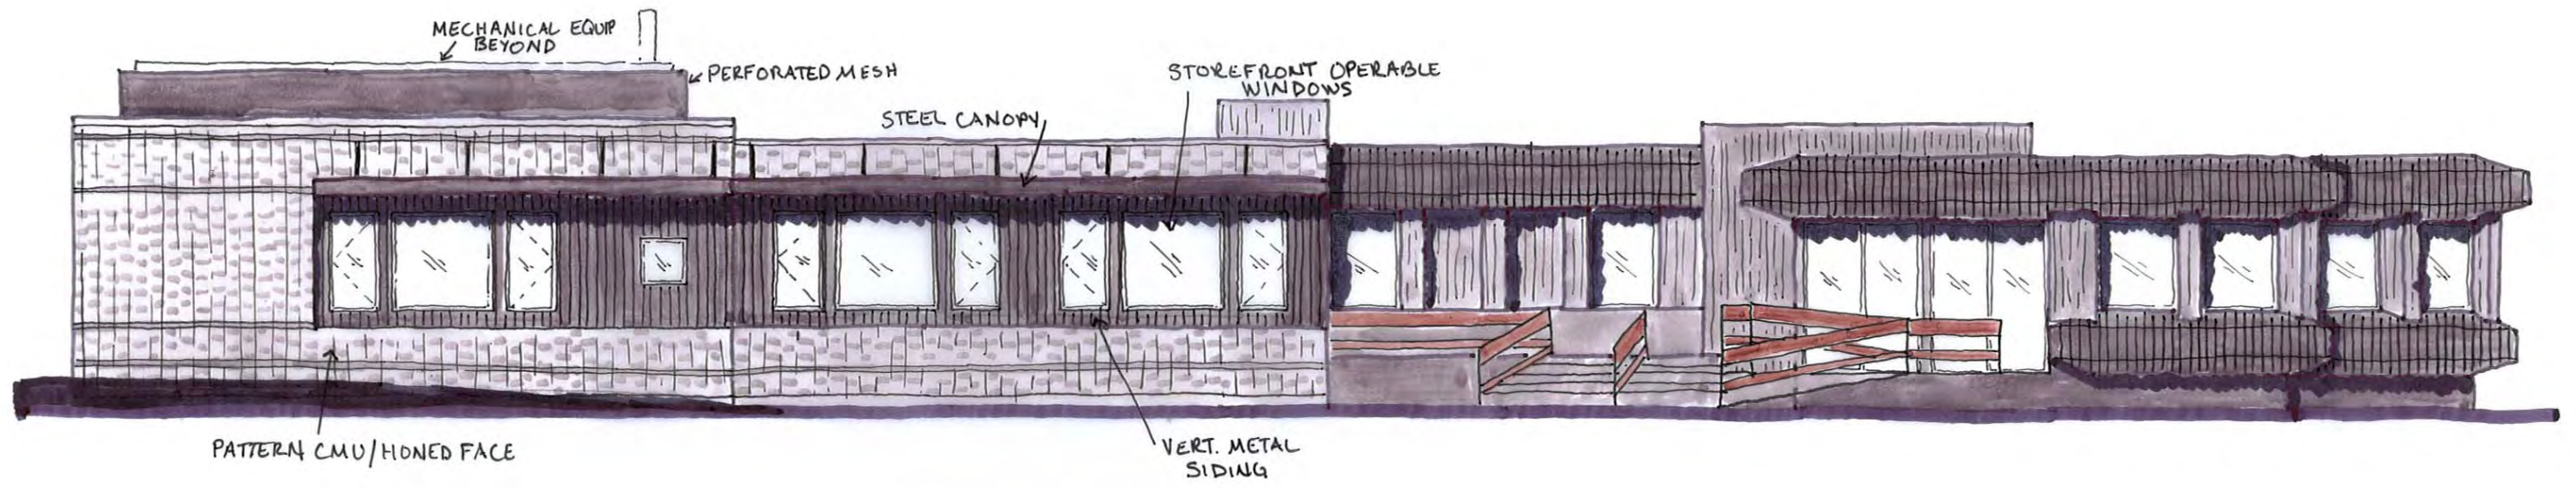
Proposed Operations Building Option B - Preferred Option, North Facade-Main Entrance
